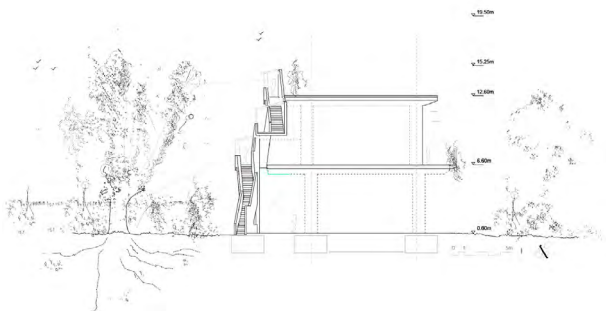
Exterior stairs and concrete skeleton structure section near the existing trees (drawing by the author).
